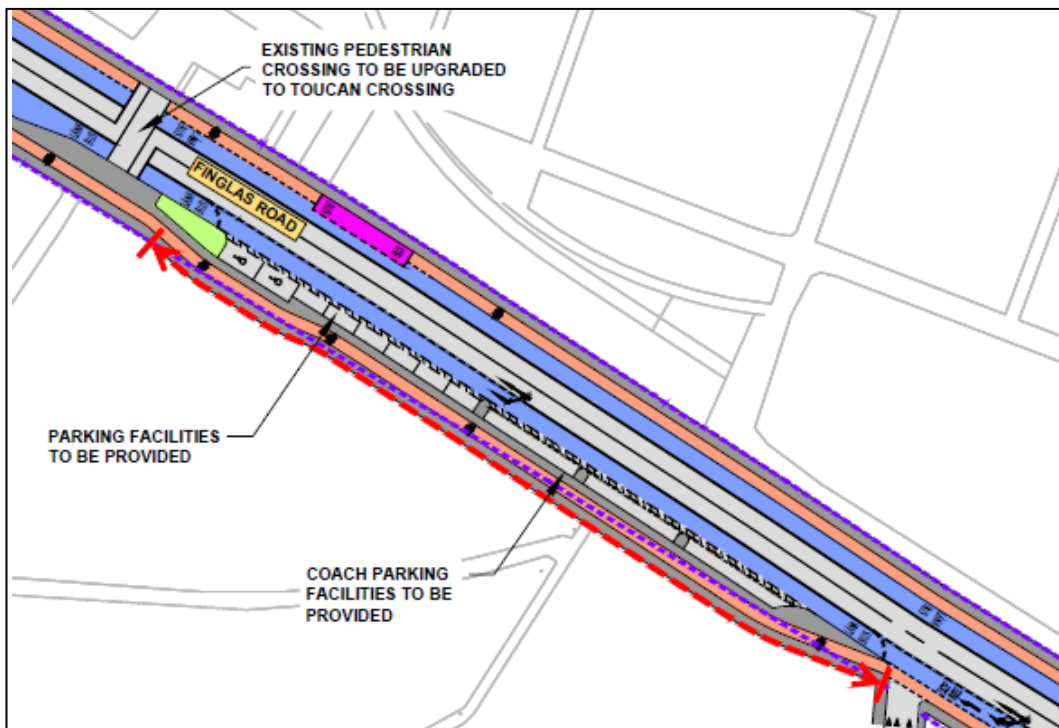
Proposed Reduced Parking Area on Finglas Road at Glasnevin Cemetery in the EPR (Option A)
